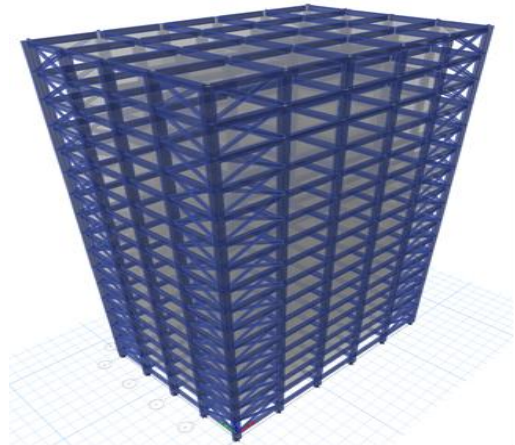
3D view of G+15 RC frame building with outer X type steel bracing
